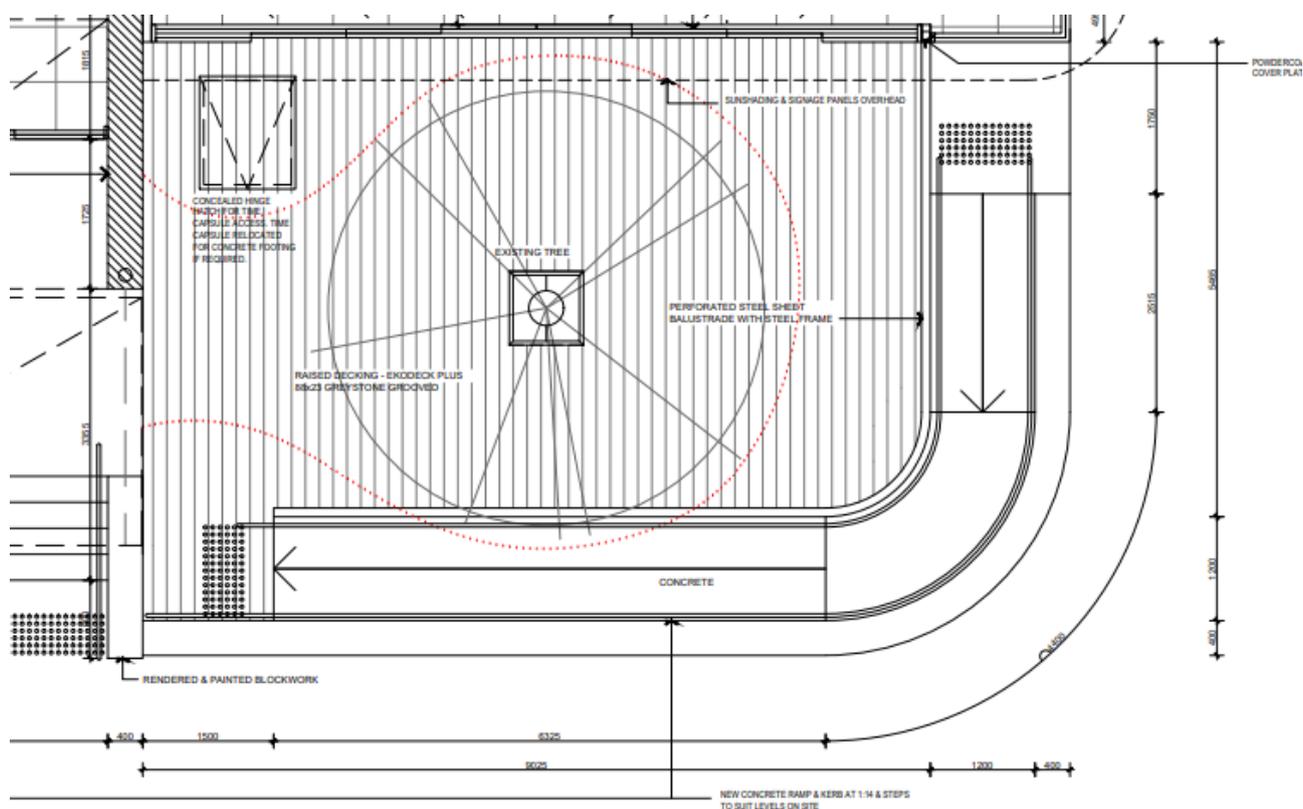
Design plan of ramp access to the Temora Memorial Town Hall
